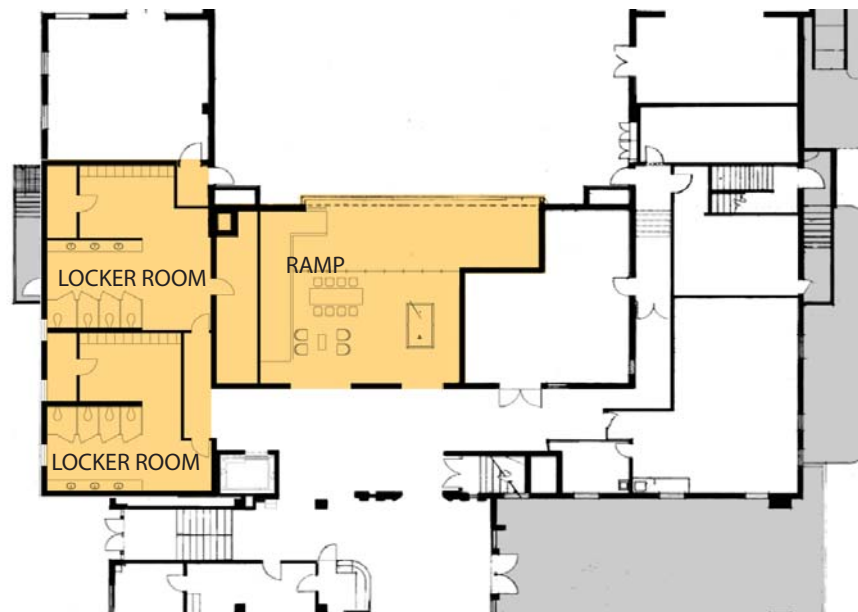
New restrooms, locker rooms, and ramp to gymnasium layout concept
